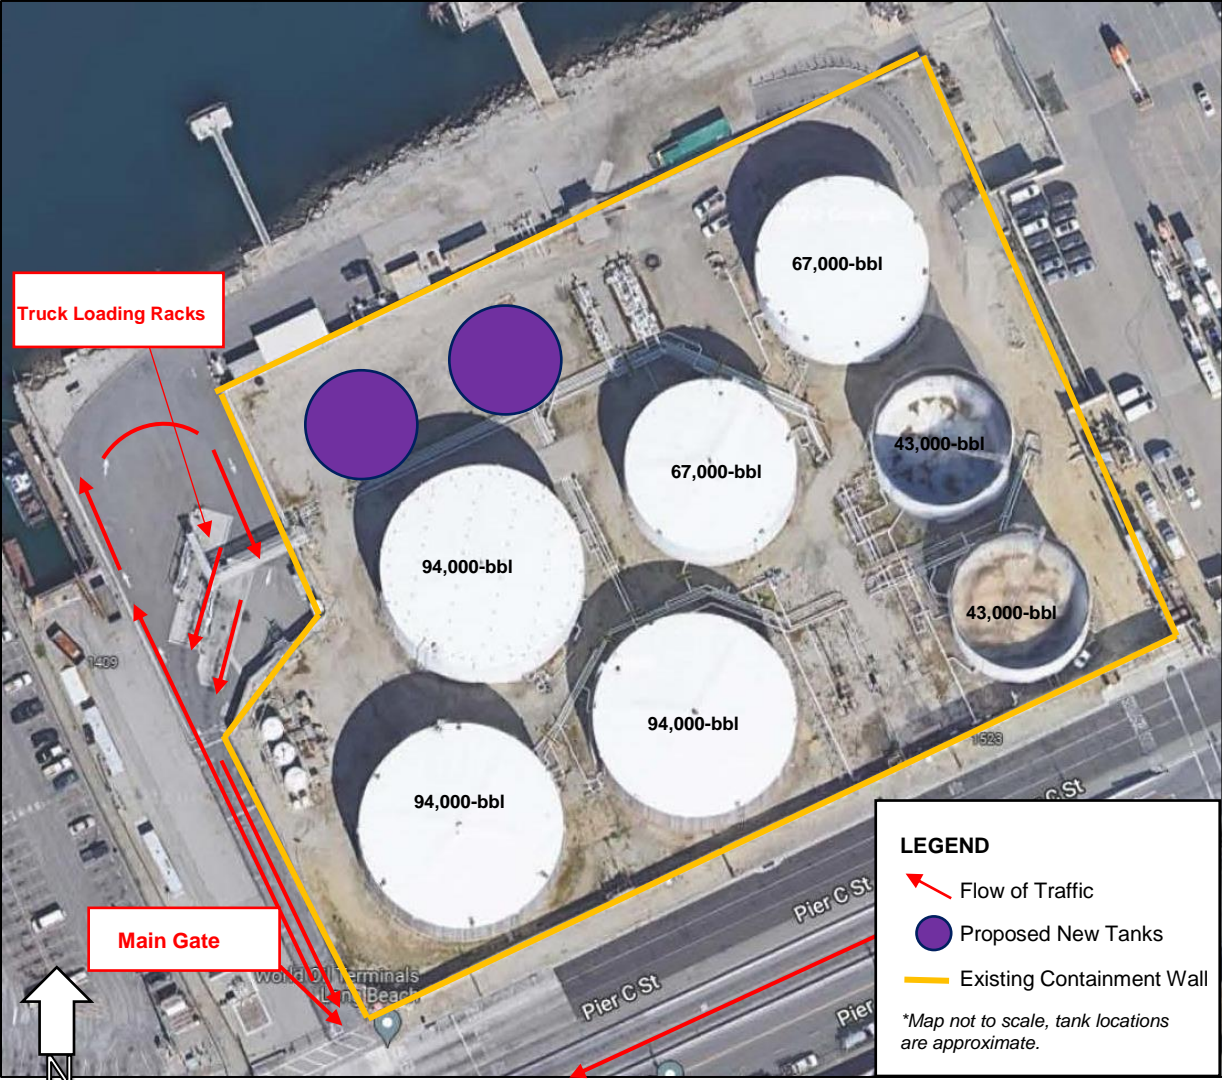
Project Site Plan – World Oil Tank Installation Project
